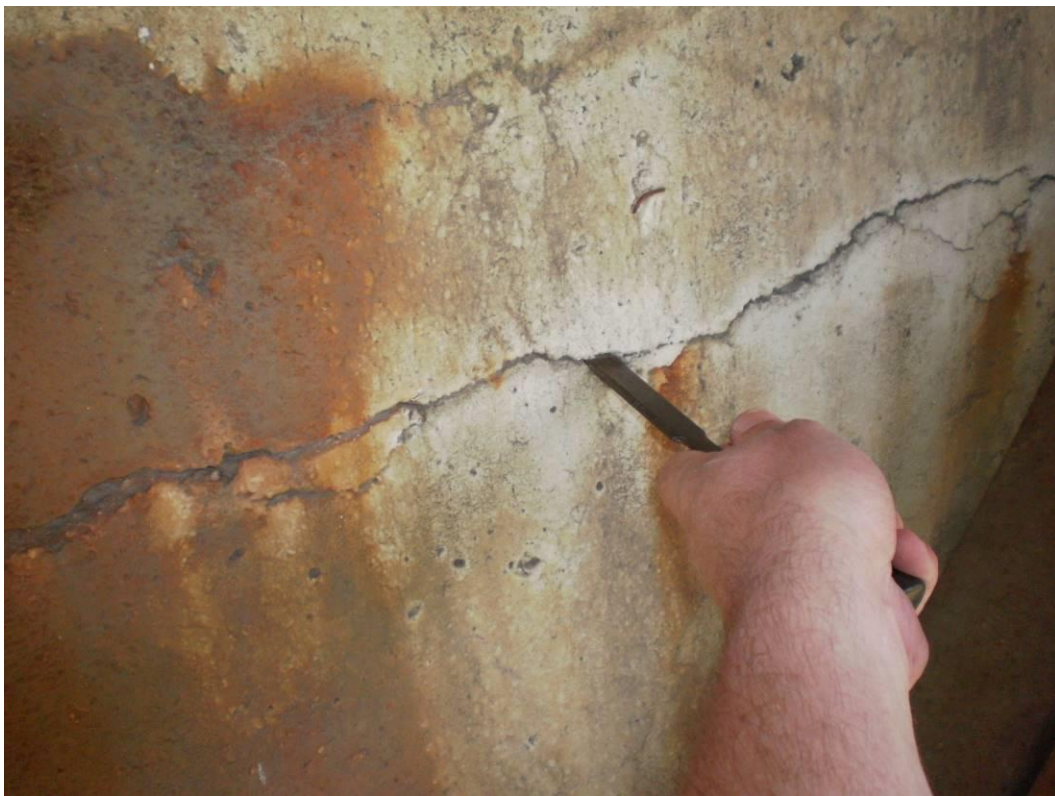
Chipped/Spalled Areas on a Pier Cap
